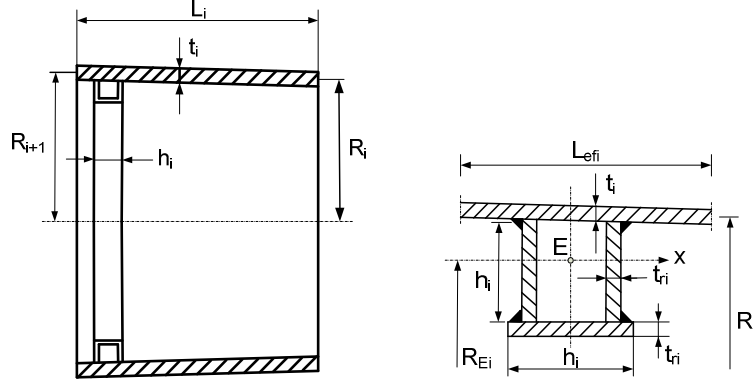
shell segment with the ring-stiffener of welded square box section
